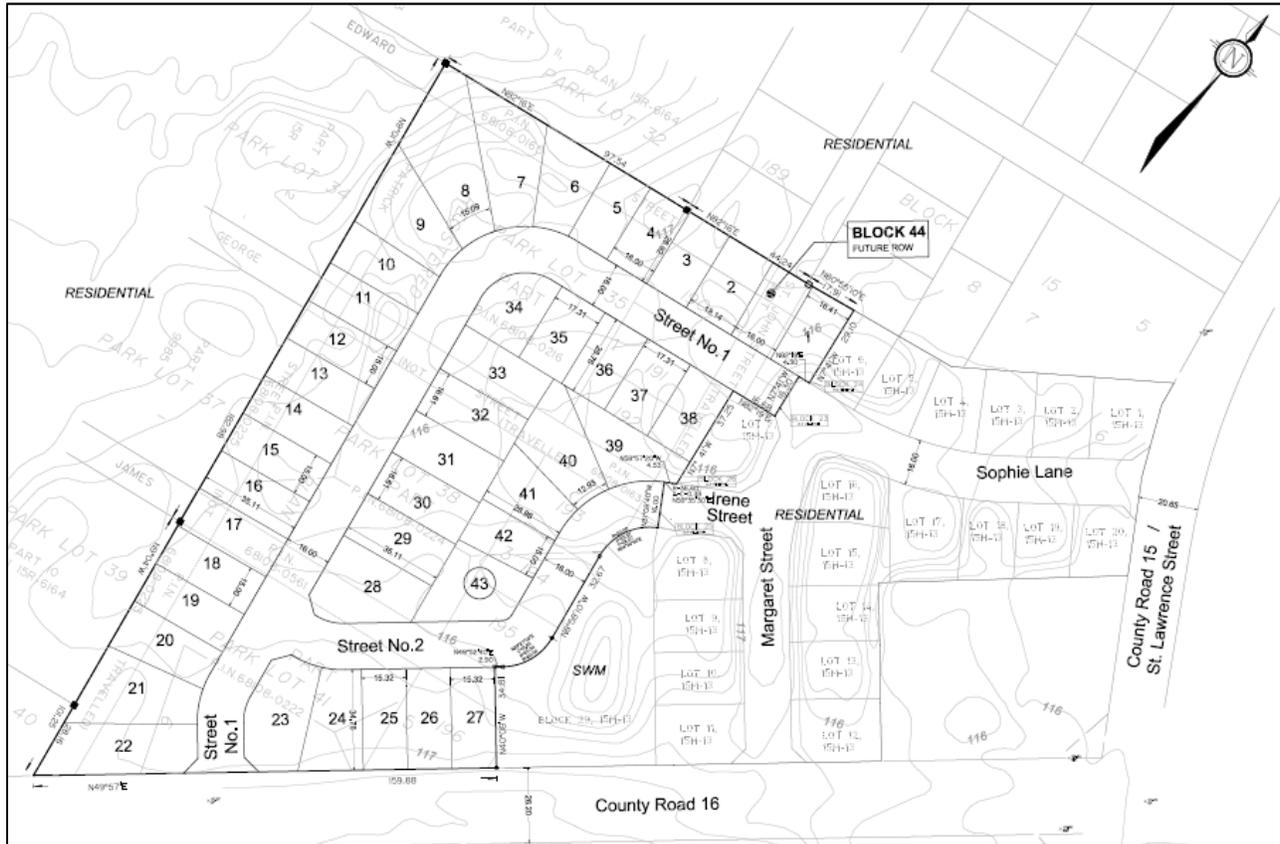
Excerpt from the Proposed Draft Plan of Subdivision
